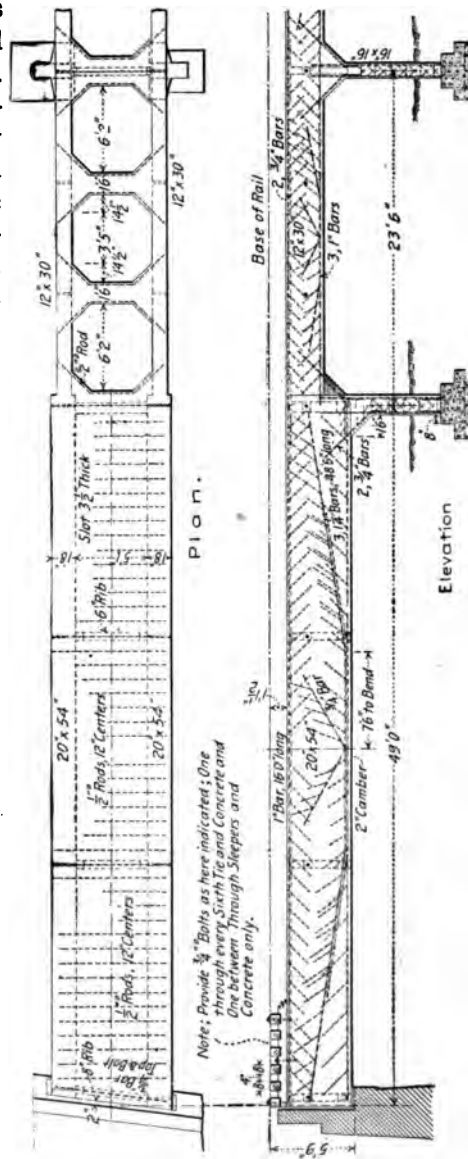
Plan and Elevation of 23-Ft. and 49-Ft. Spans, Richmond Viaduct.
